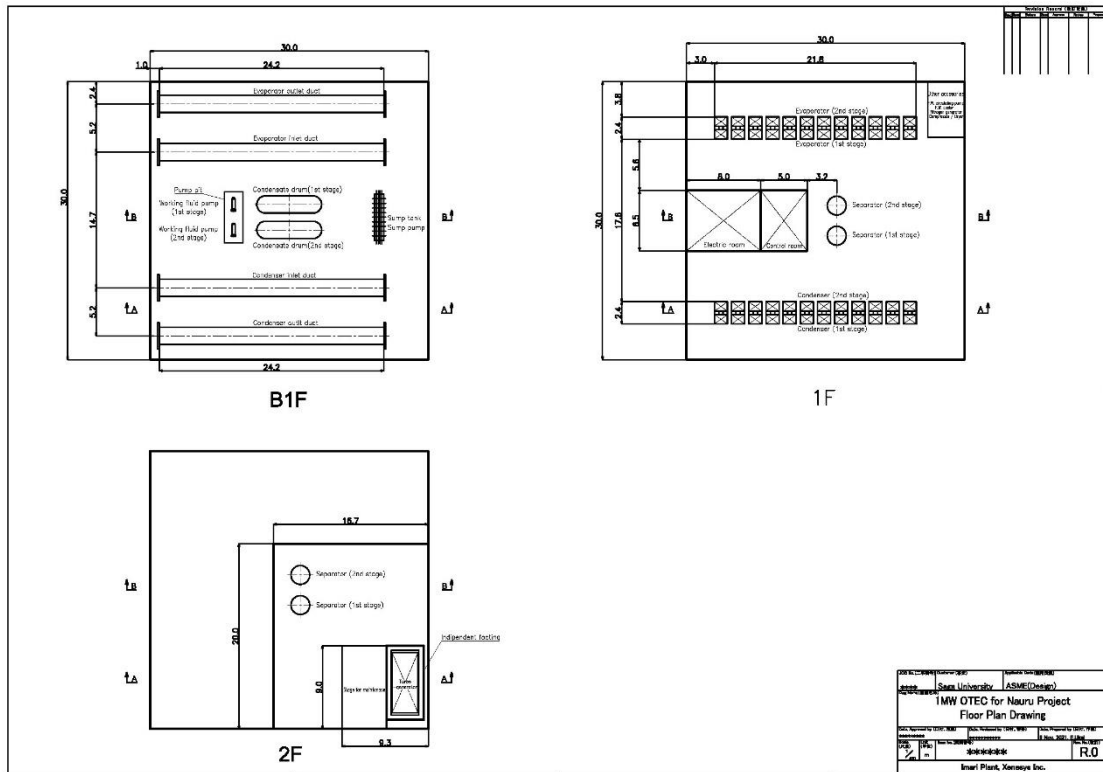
Optimized OTEC Facility Floor Plan Overhead View
